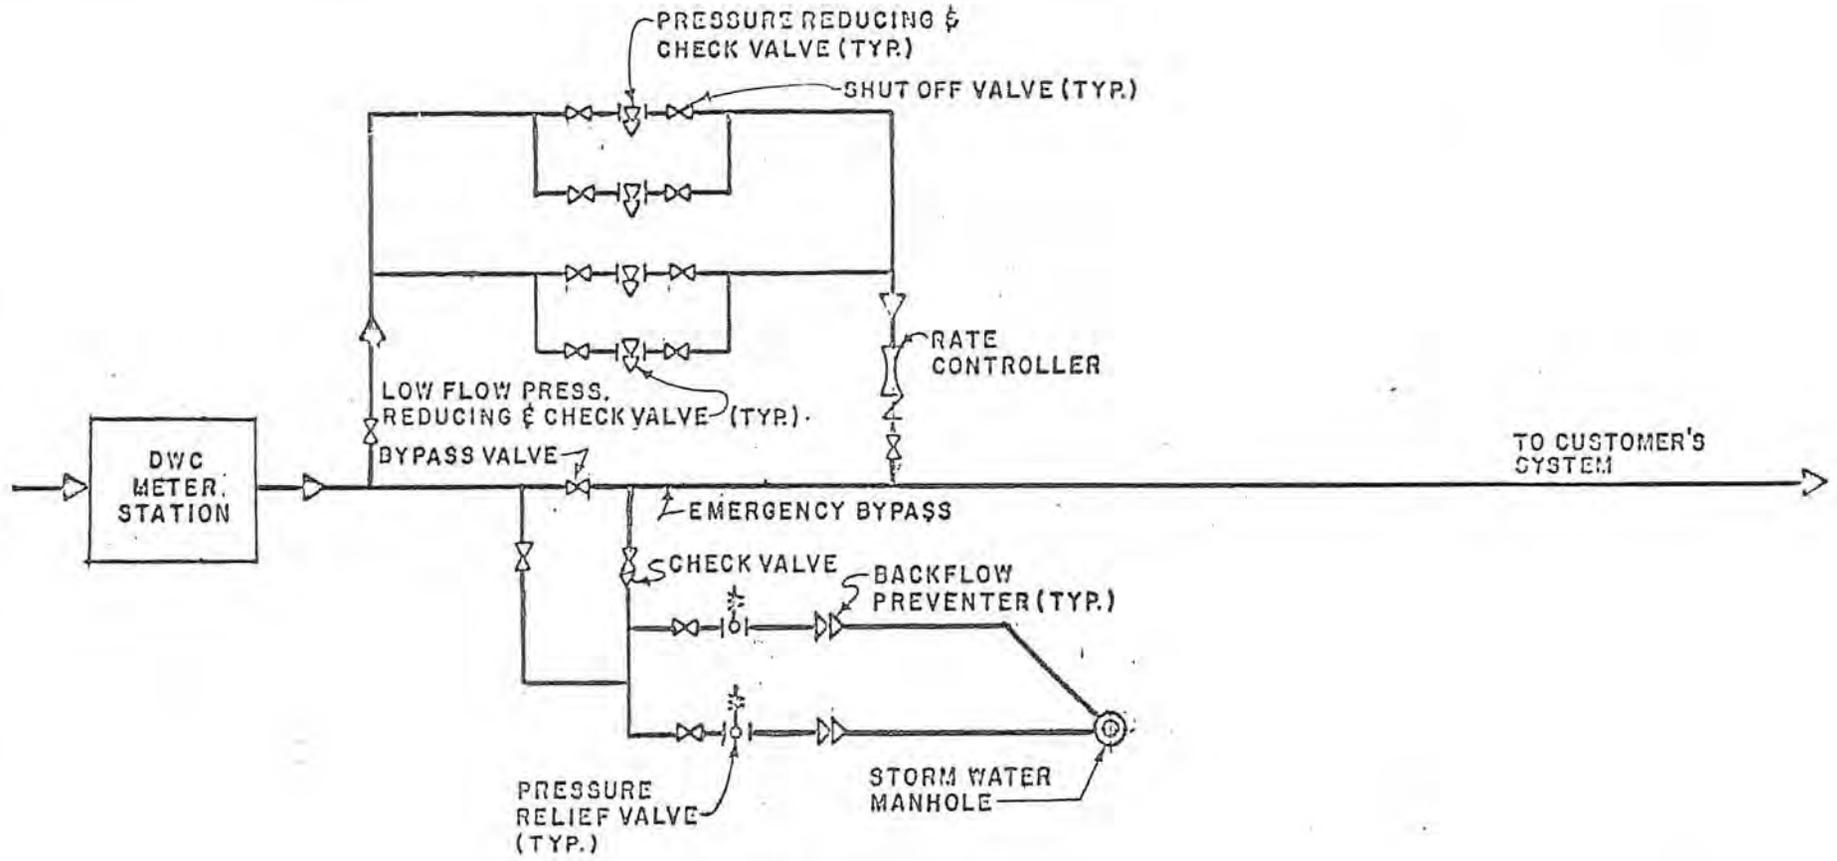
MONTGOMERY UNIT SYSTEM CONNECTION FACILITIES
